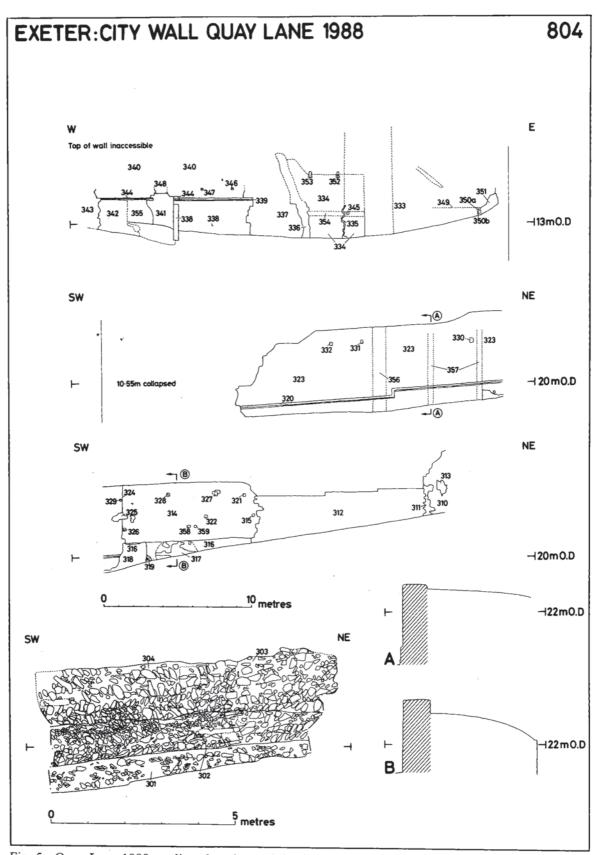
Quay Lane 1988, outline elevation and detail of wall core recorded in 1979.
